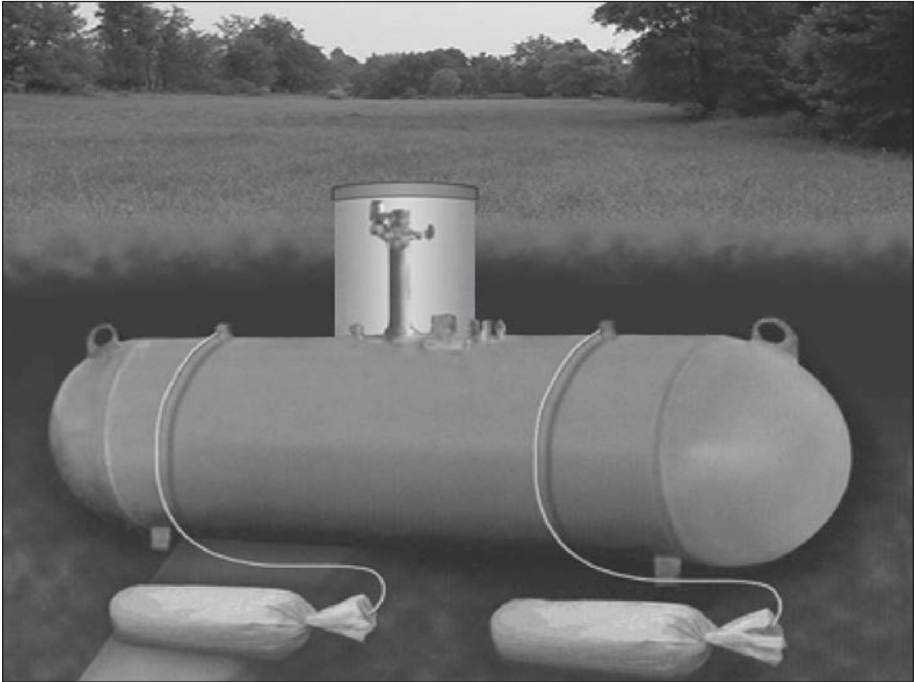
Typical residential underground tank. The parcels underneath provide grounding and corrosion control (courtesy of Blossman Propane).
